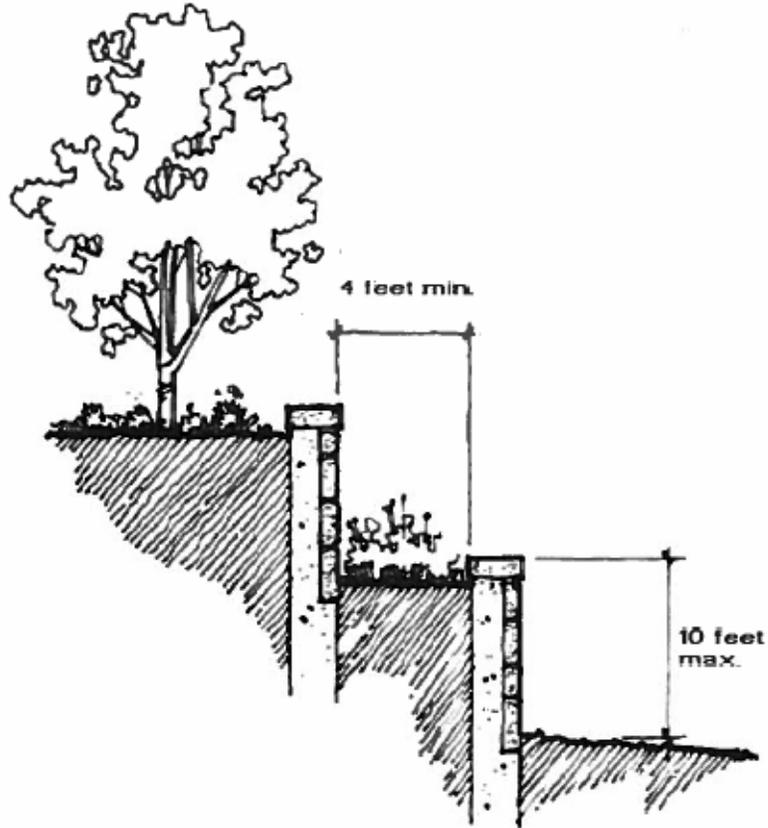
The width of the terrace between any two 10-foot retaining walls shall be a minimum of four feet (4') with a maximum slope of 2:1. Terraces created between retaining walls shall be permanently landscaped or re-vegetated on a regular basis.
